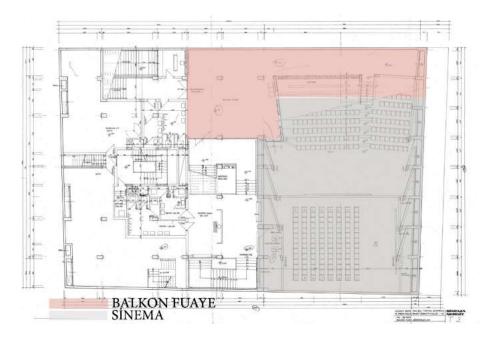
8: Kavaklıdere Cinema ground floor plan (Bayraktar, 2014)
